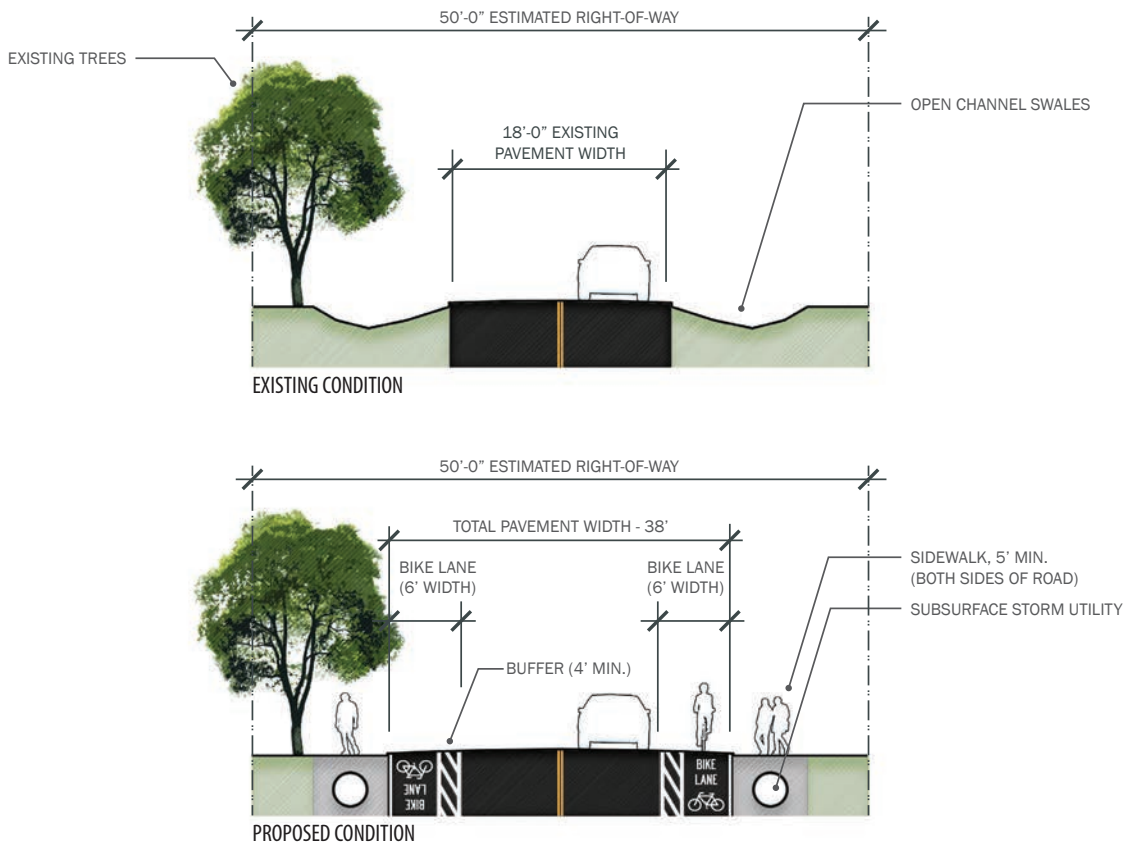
Cross-section study of existing and proposed conditions of typical corridor with 50' right-of-way
